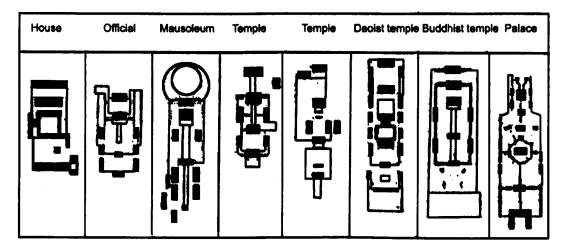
Examples of plan arrangement of buildings of different functions (Li, 2005, p78)
